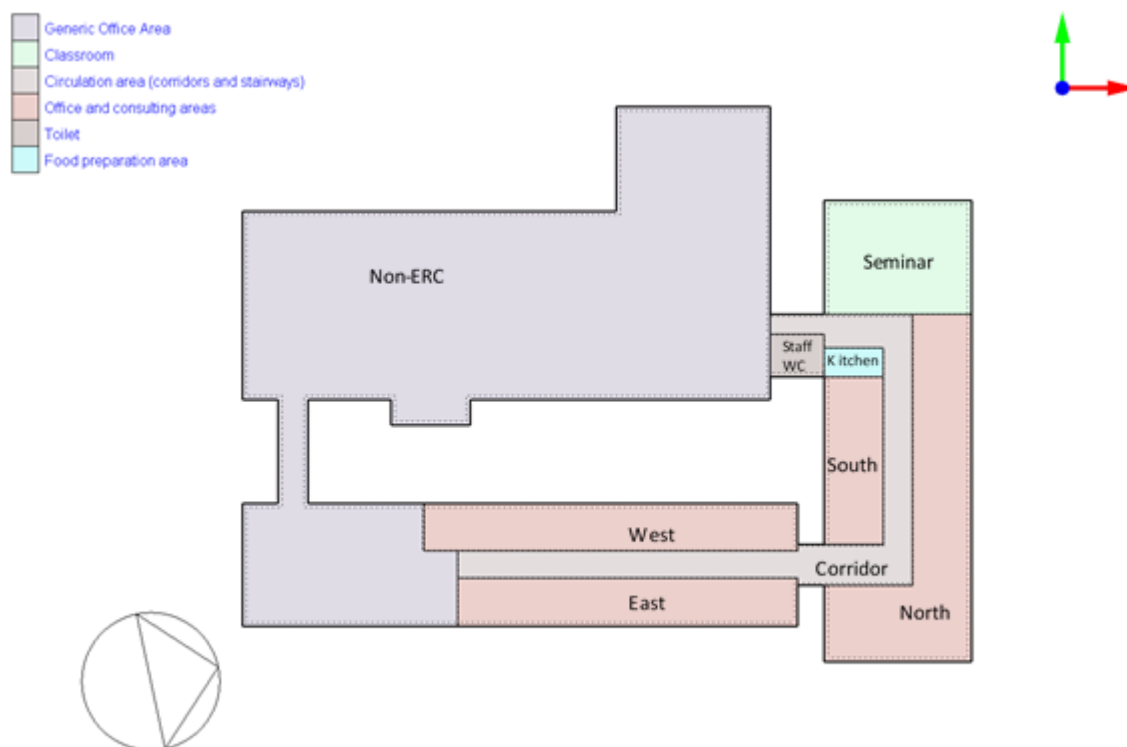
Simplified floor plan of Level 6, showing ERC and ‘Non-ERC’ generic thermal zones
